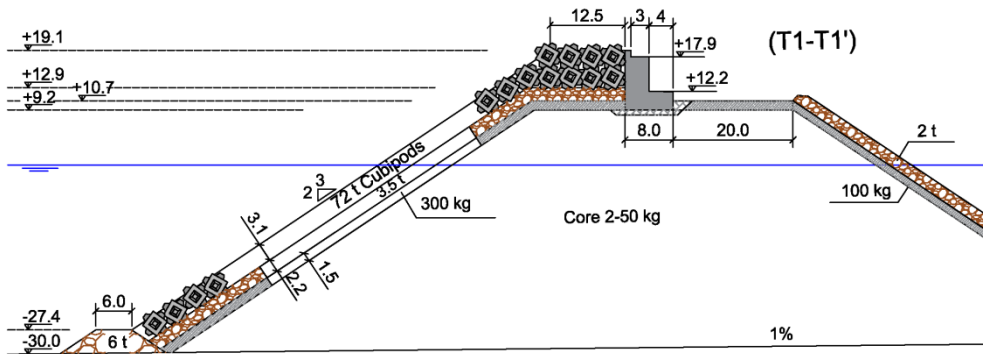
Cross section of a single-layer Cubipod[®] armored breakwater trunk.
